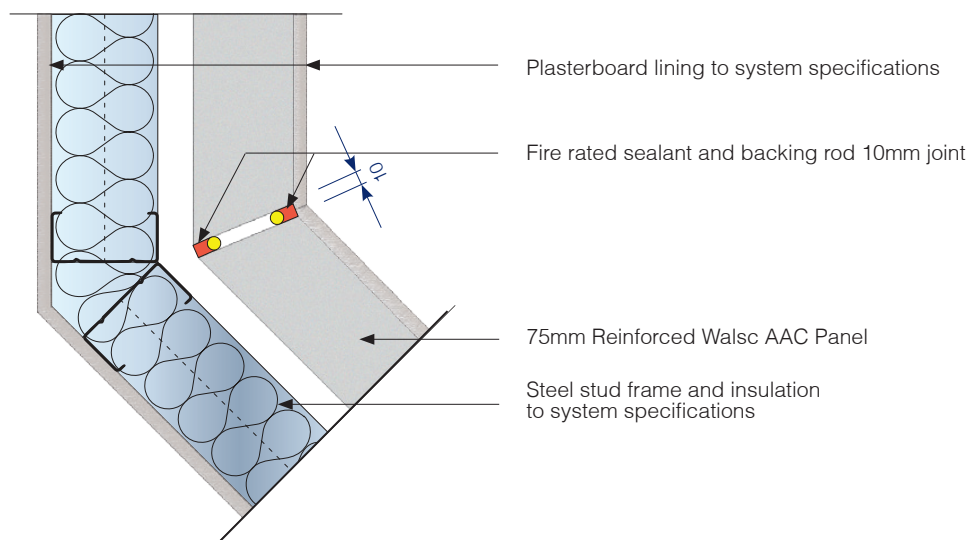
Internal Cavity Wall System Mitred Control Joint Detail
